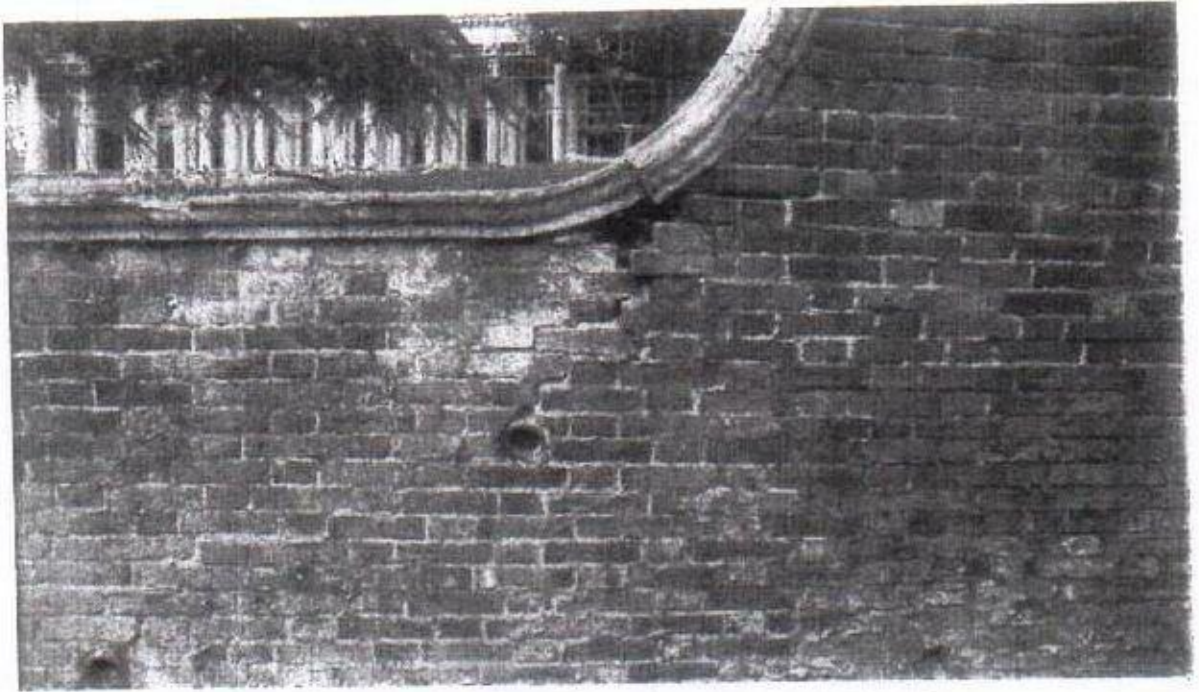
ITALIAN TERRACED GARDEN TOP HEAD WALL 18
